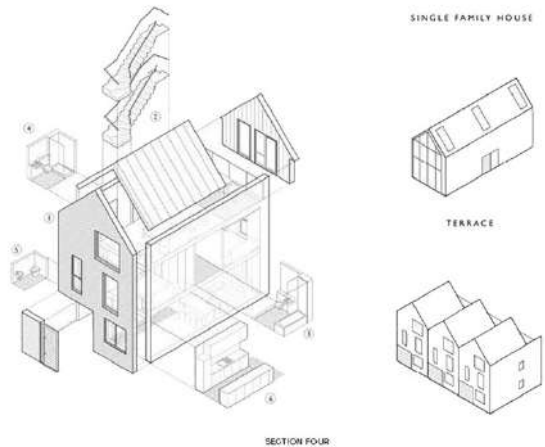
Town House in new Islington, Manchester (Shedkm Architects, 2016).
